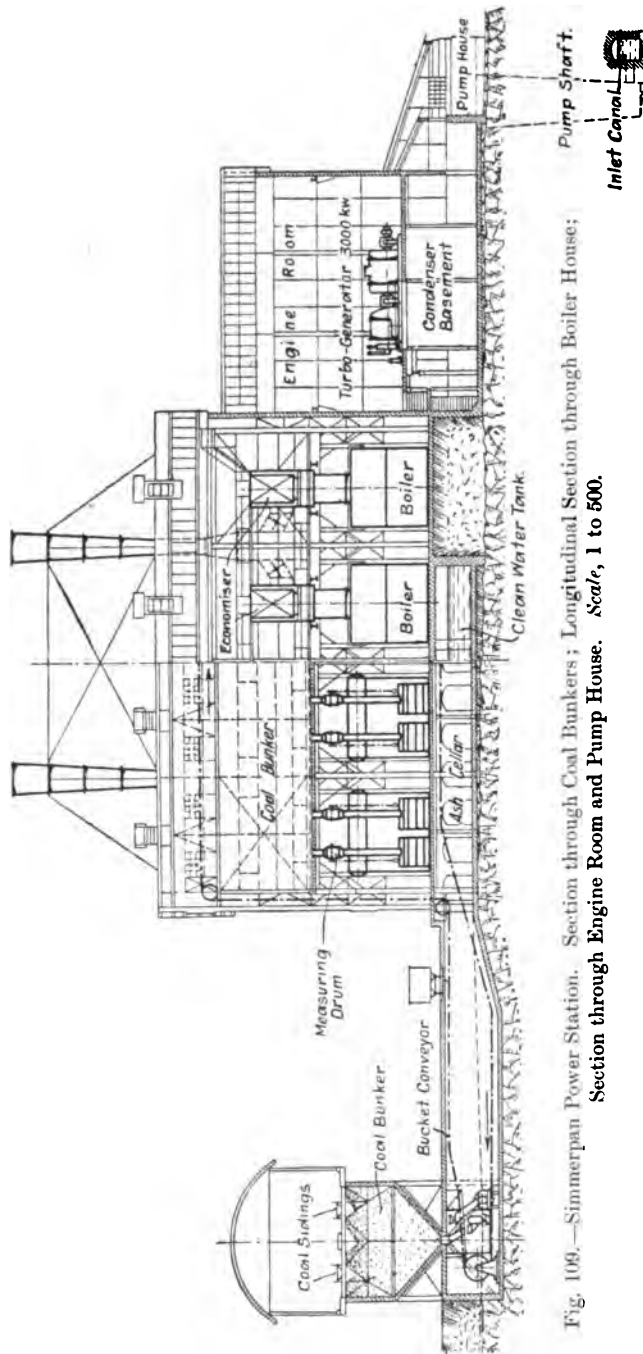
Simmerpan Power Station. Section through Coal Bunkers; Longitudinal Section through Boiler House; Section through Engine Room and Pump House. Scale, 1 to 500.
